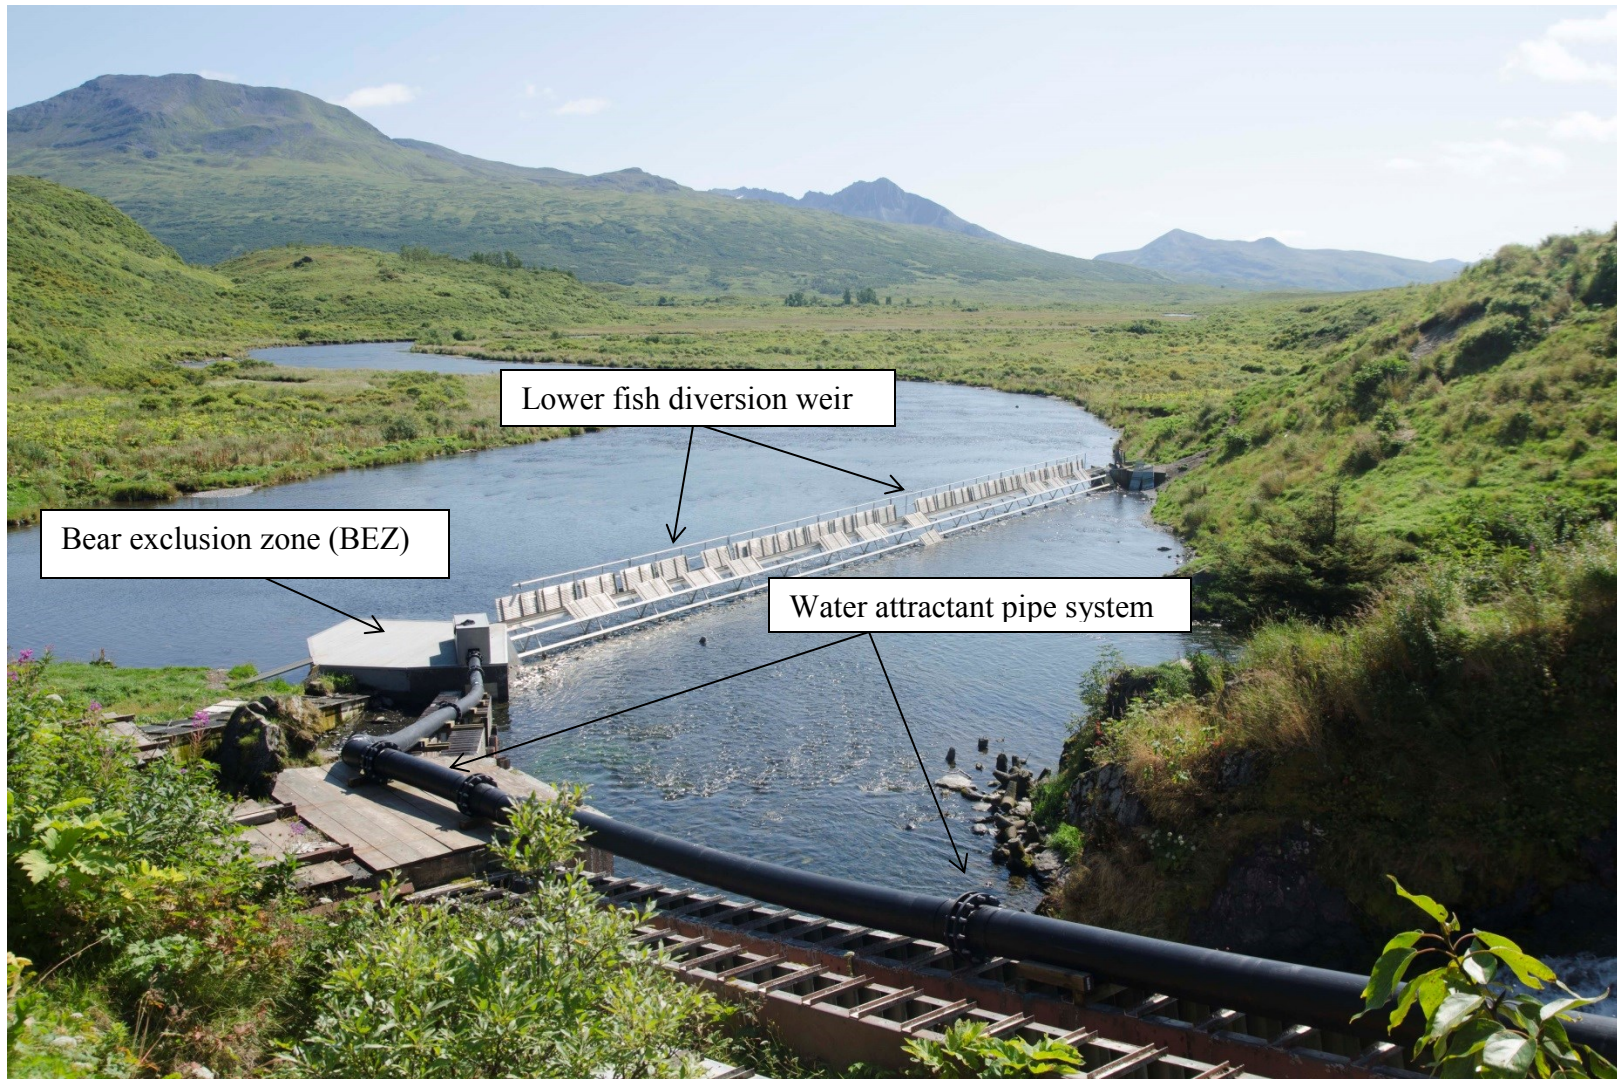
View of the Frazer fish pass, water attractant pipe system, bear exclusion zone, and lower fish diversion weir prior to panel installation.
